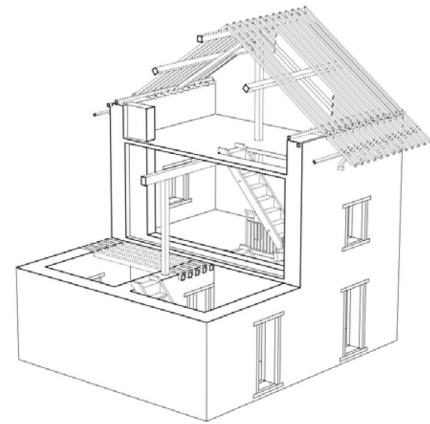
Typical Newar house with wooden construction (Bonpace & Sestini, 2003, p. 58)
